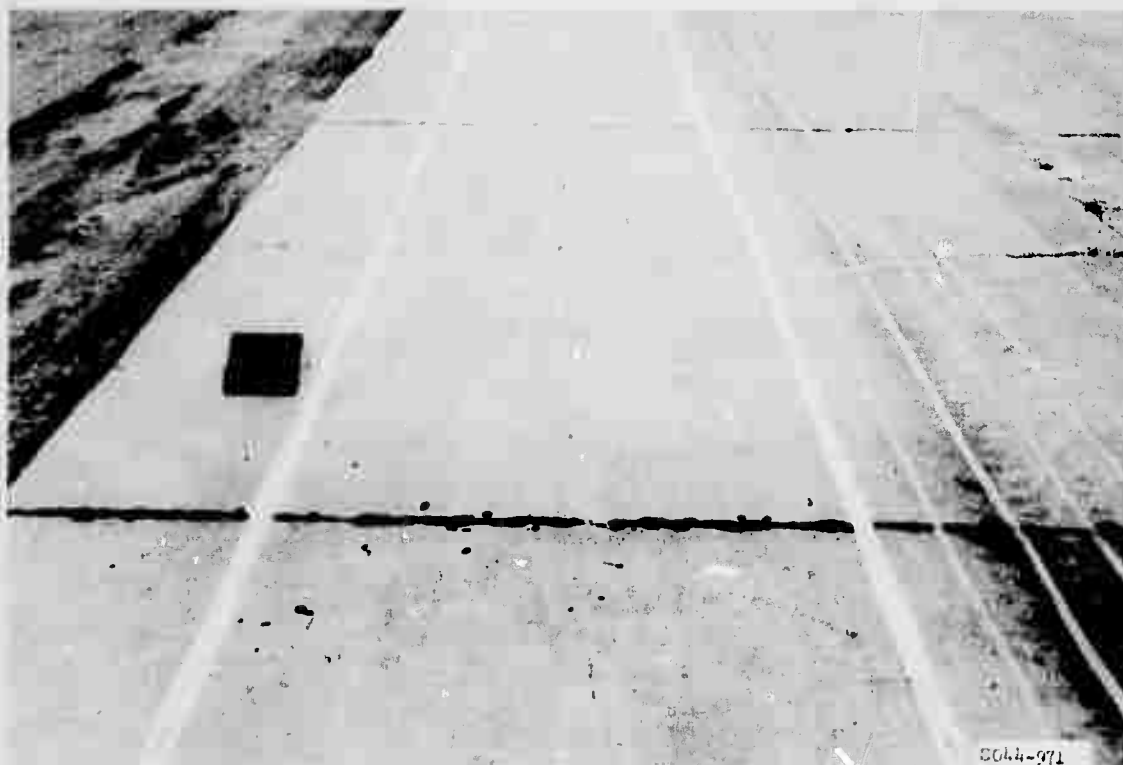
Item 3, lane 2, rigid pavement test section, prior to traffic
